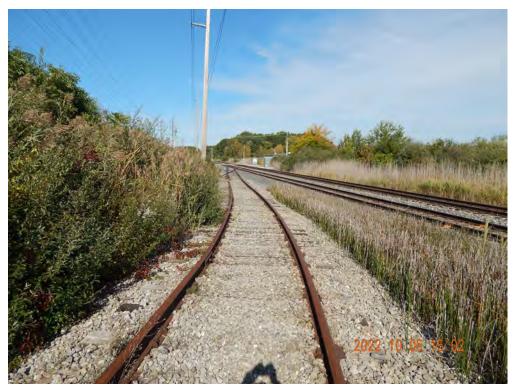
Rail Spur Near NoBo Marijuana Cultivation Facility Potential Transload Location Looking Towards CSX Mainline
